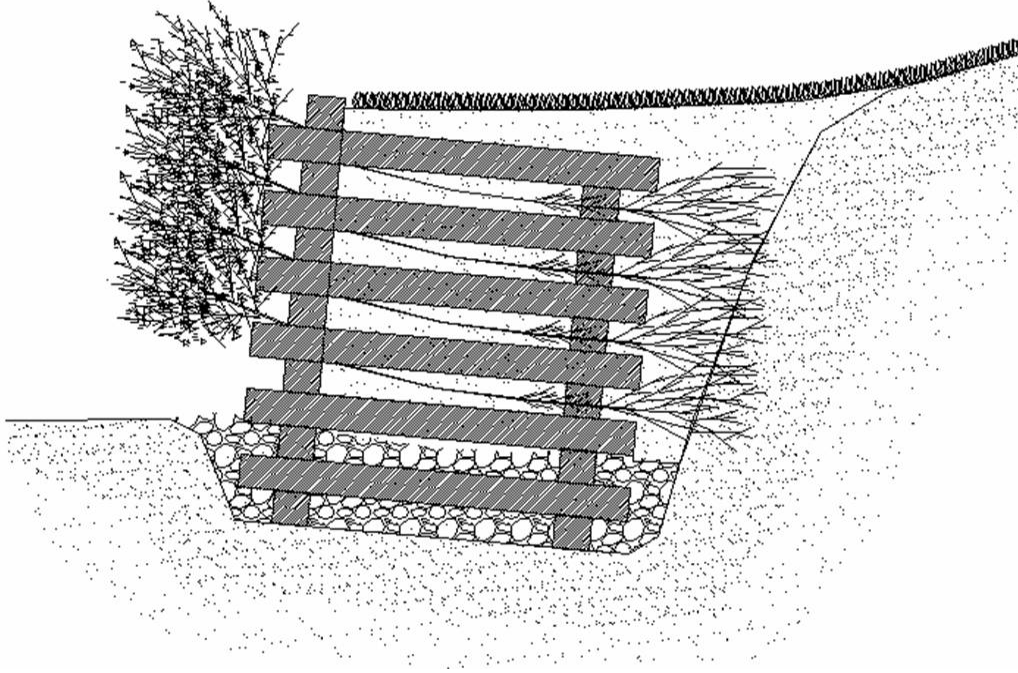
With a living timber crib, it is best to use rock or gravel to help drainage and protect the structure and backslope stability.
